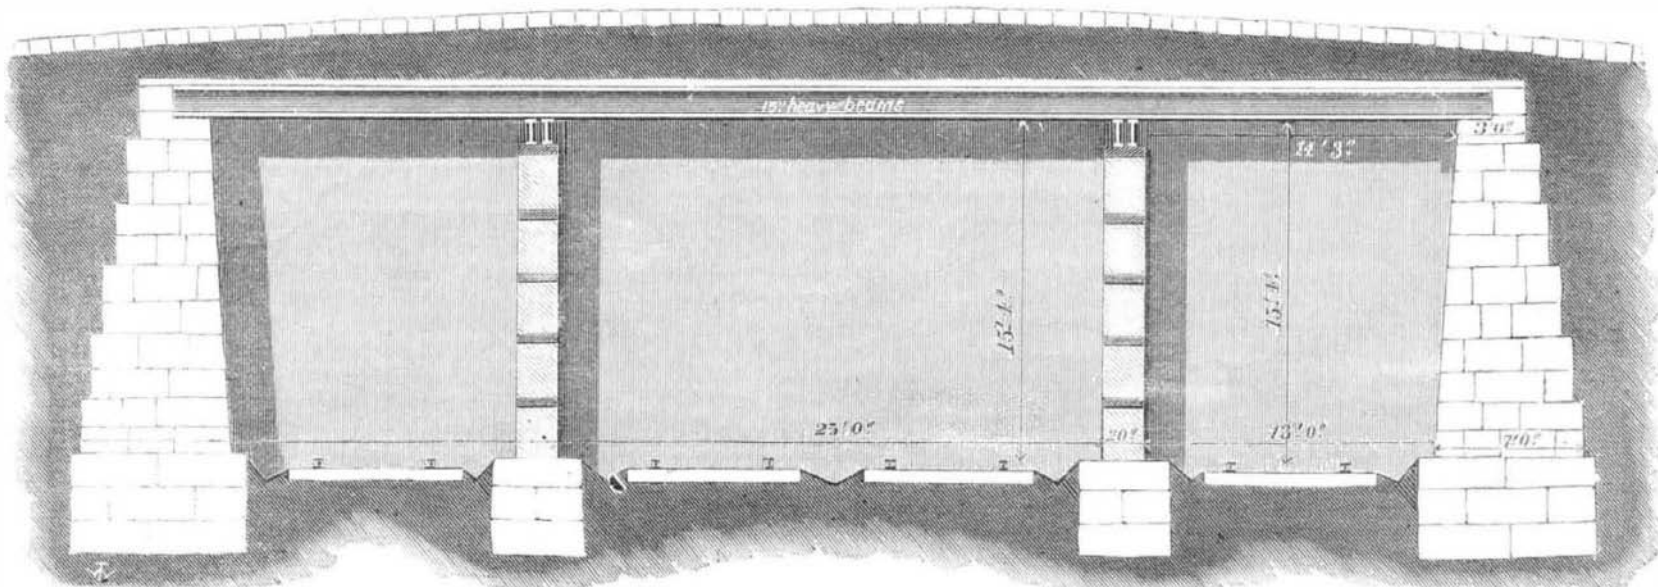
THE UNDERGROUND RAILWAY, NEW YORK CITY.—SECTIONAL ELEVATION OF THE BEAM TUNNELS, BETWEEN THE VENTILATORS,—59TH TO 76TH STREETS.
